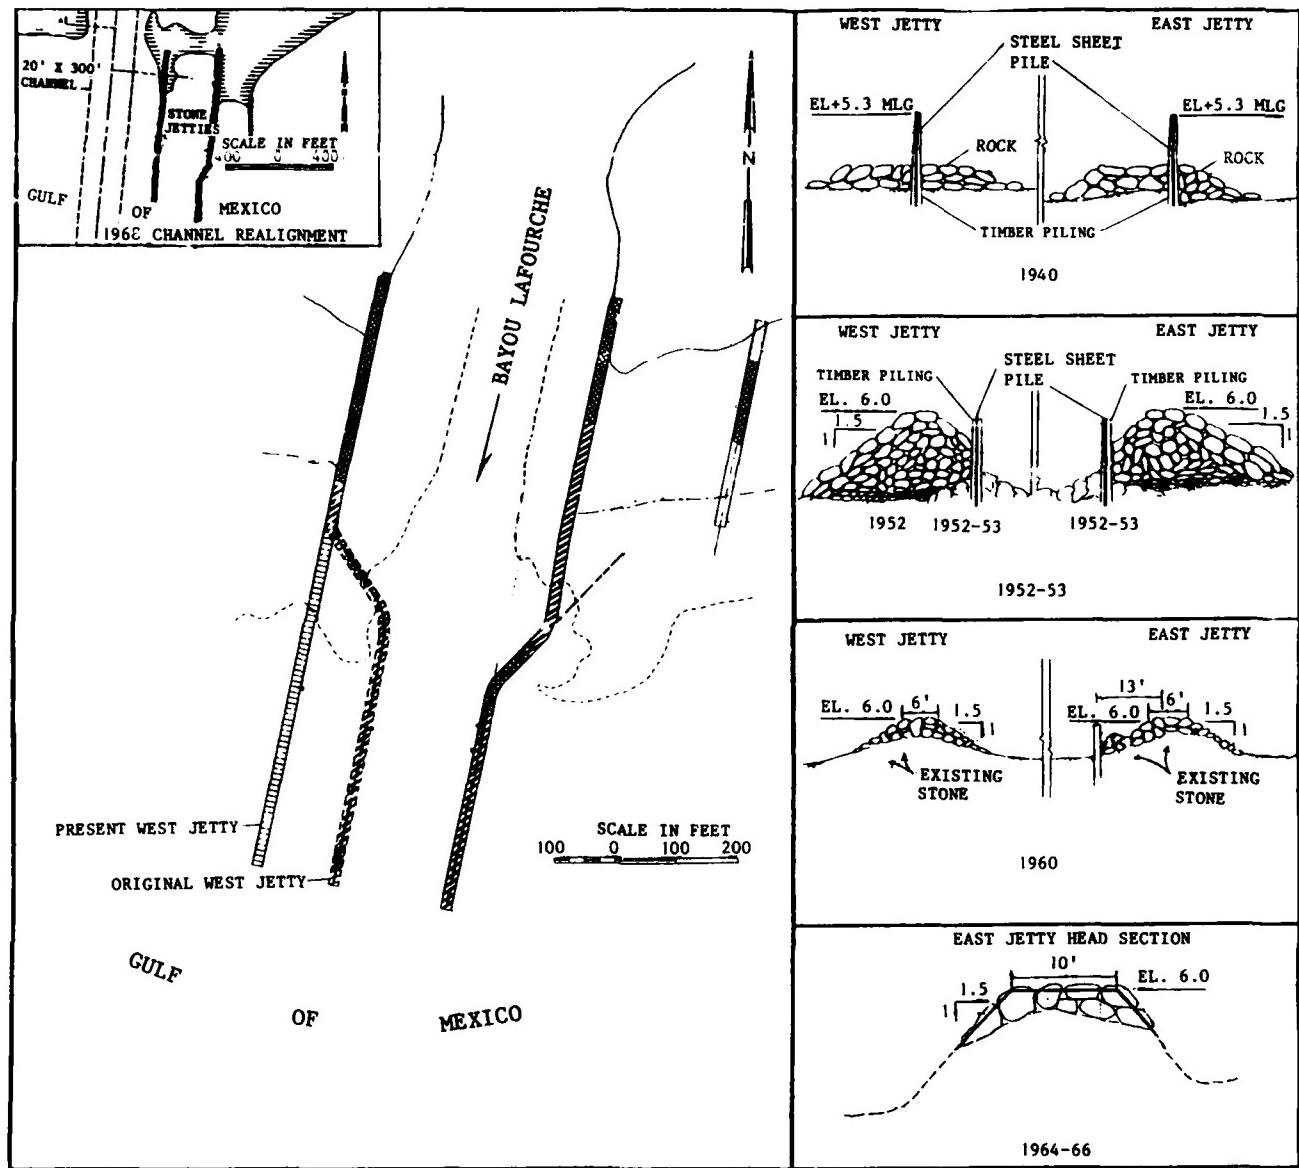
Plan views of Bayou Lafourche jetties and typical cross sections
